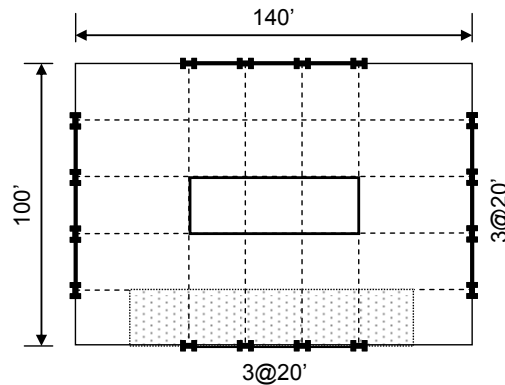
Plan view of typical archetype building with perimeter moment resisting frames.
